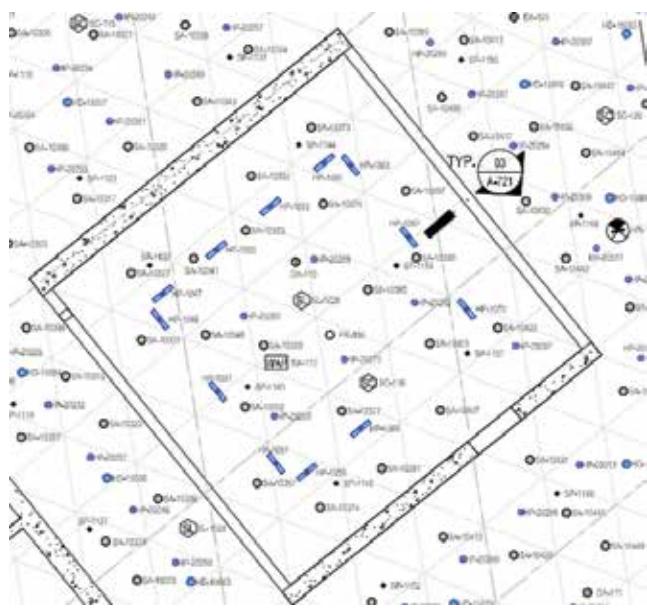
Example of an architectural reflected ceiling plan (RCP) indicating triangular plywood soffit form seam arrangement (courtesy of Largo Concrete, Inc.)
